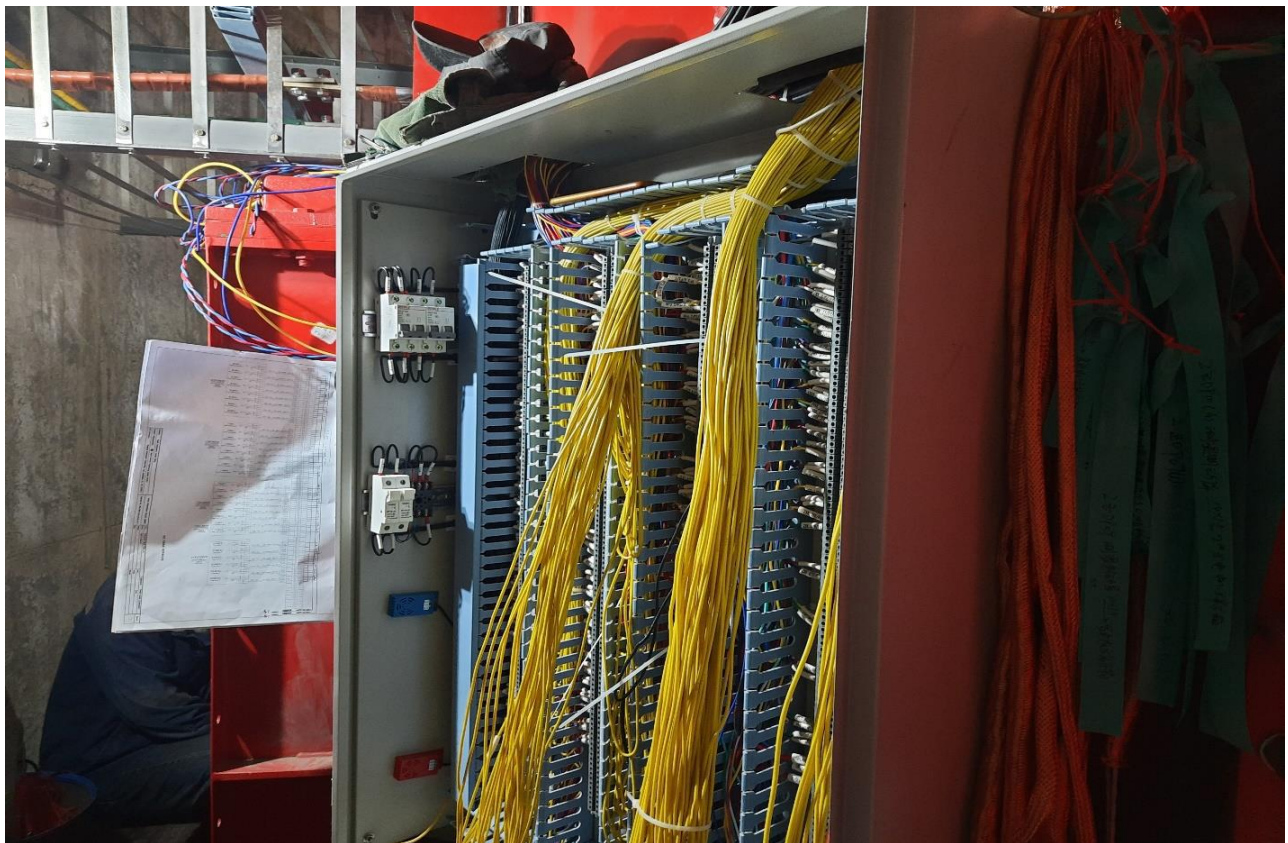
Cable Connection in Generator Terminal Box Unit -I
